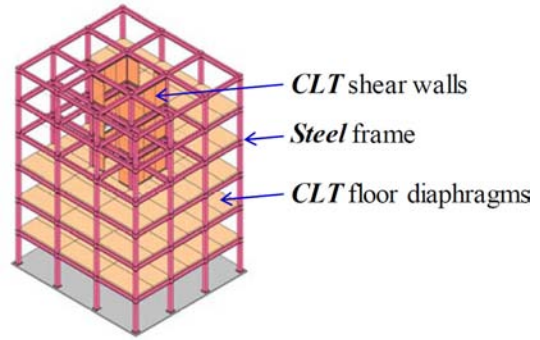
An example of a hybrid structure utilizing CLT panels as shear walls or floor diaphragms.
